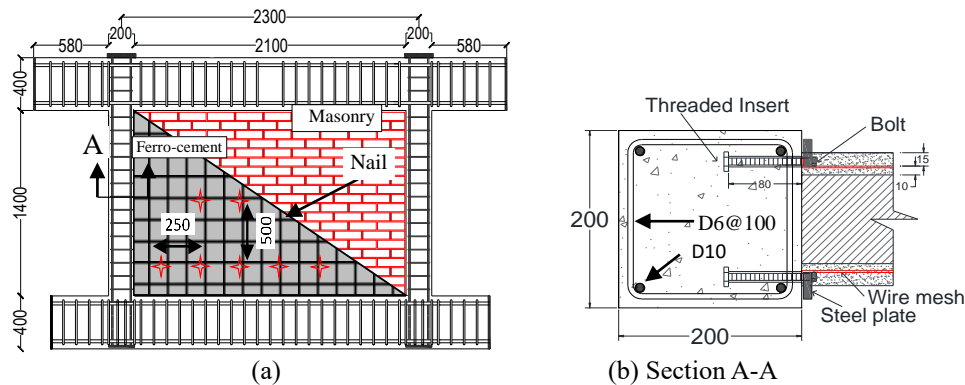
(a) Geometry of masonry infilled RC frame and (b) connection of wire mesh to RC frame
